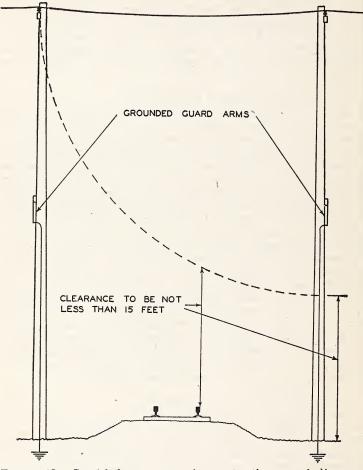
Special short-span crossing construction—supply lines over railways.
